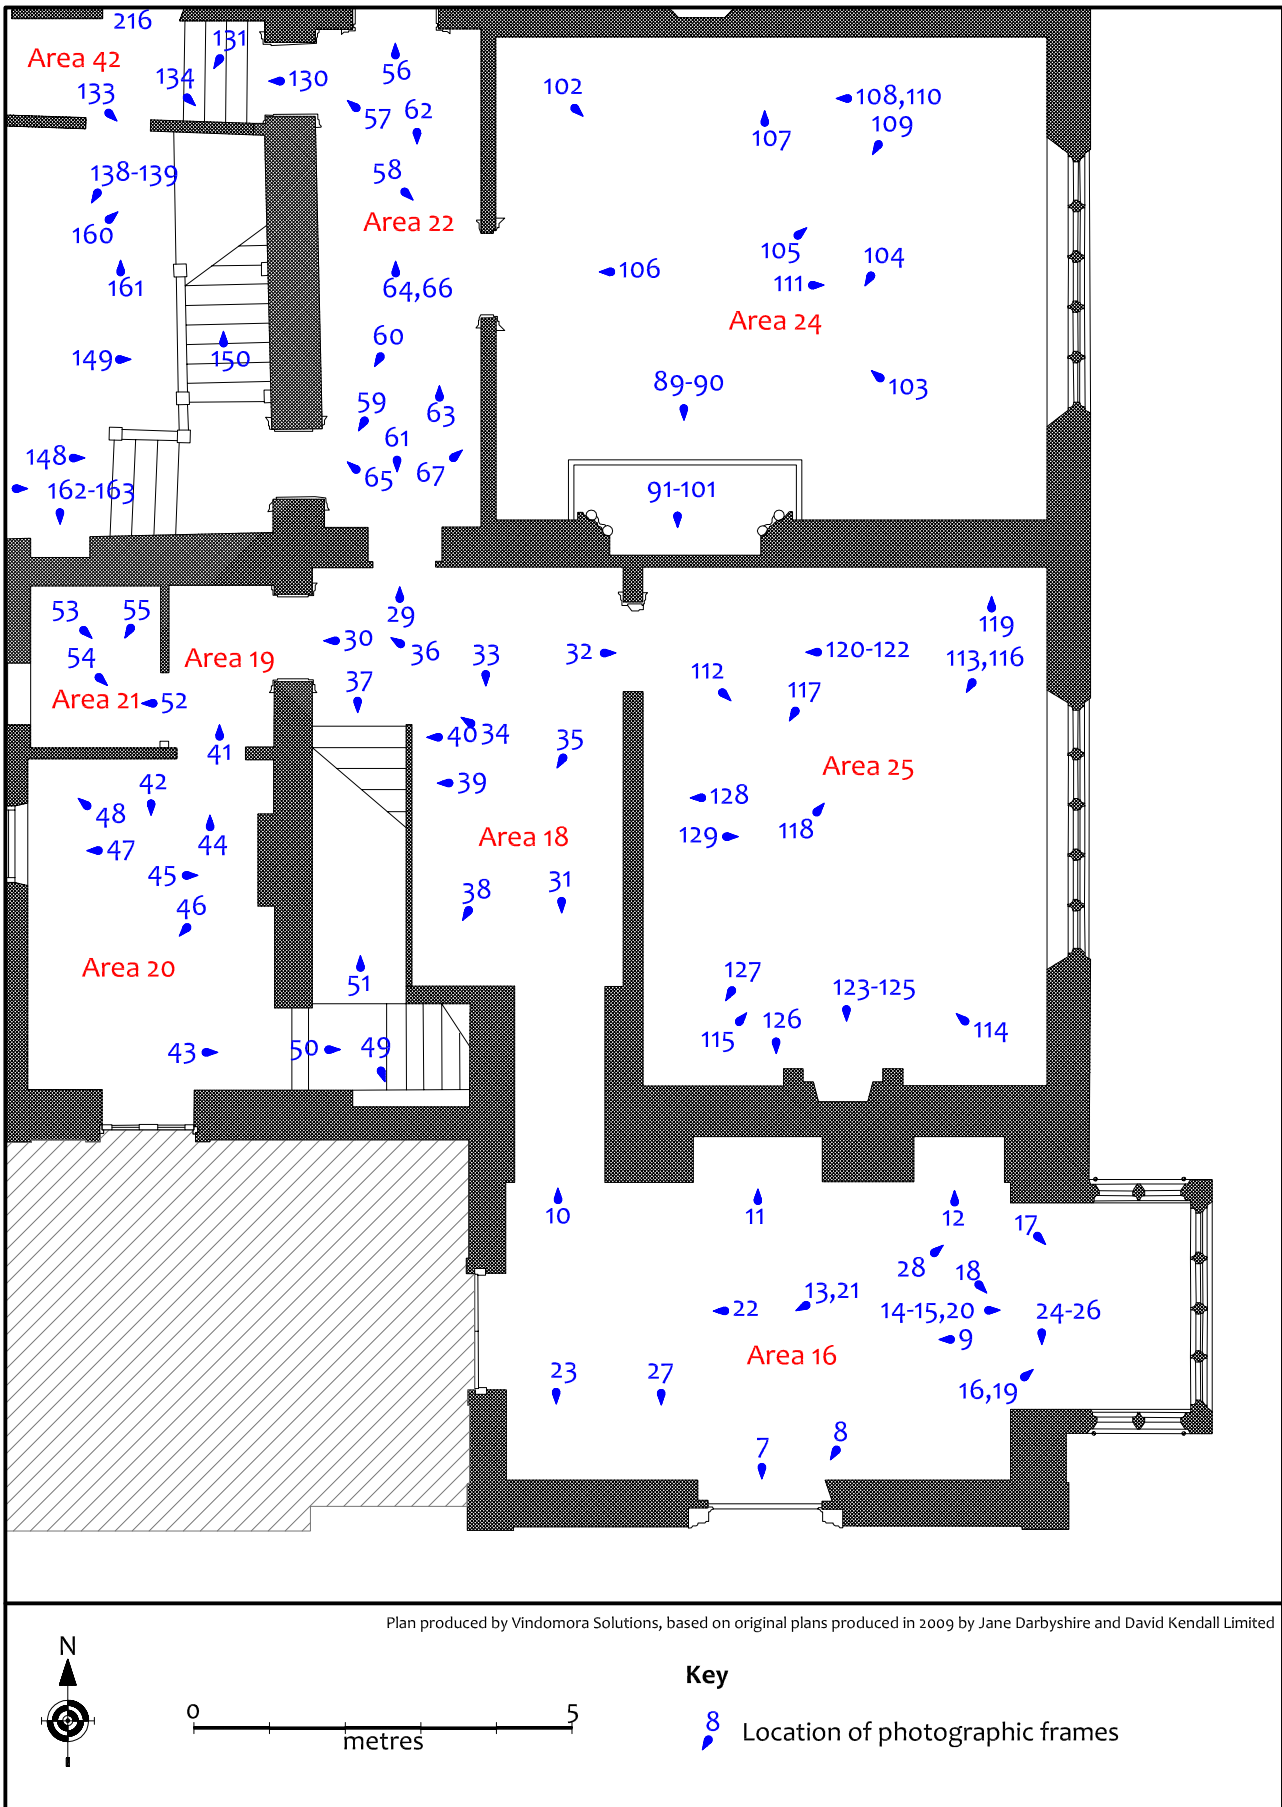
Ground floor plan showing location of photographic frames. Areas 16, 18-22, 24-25
